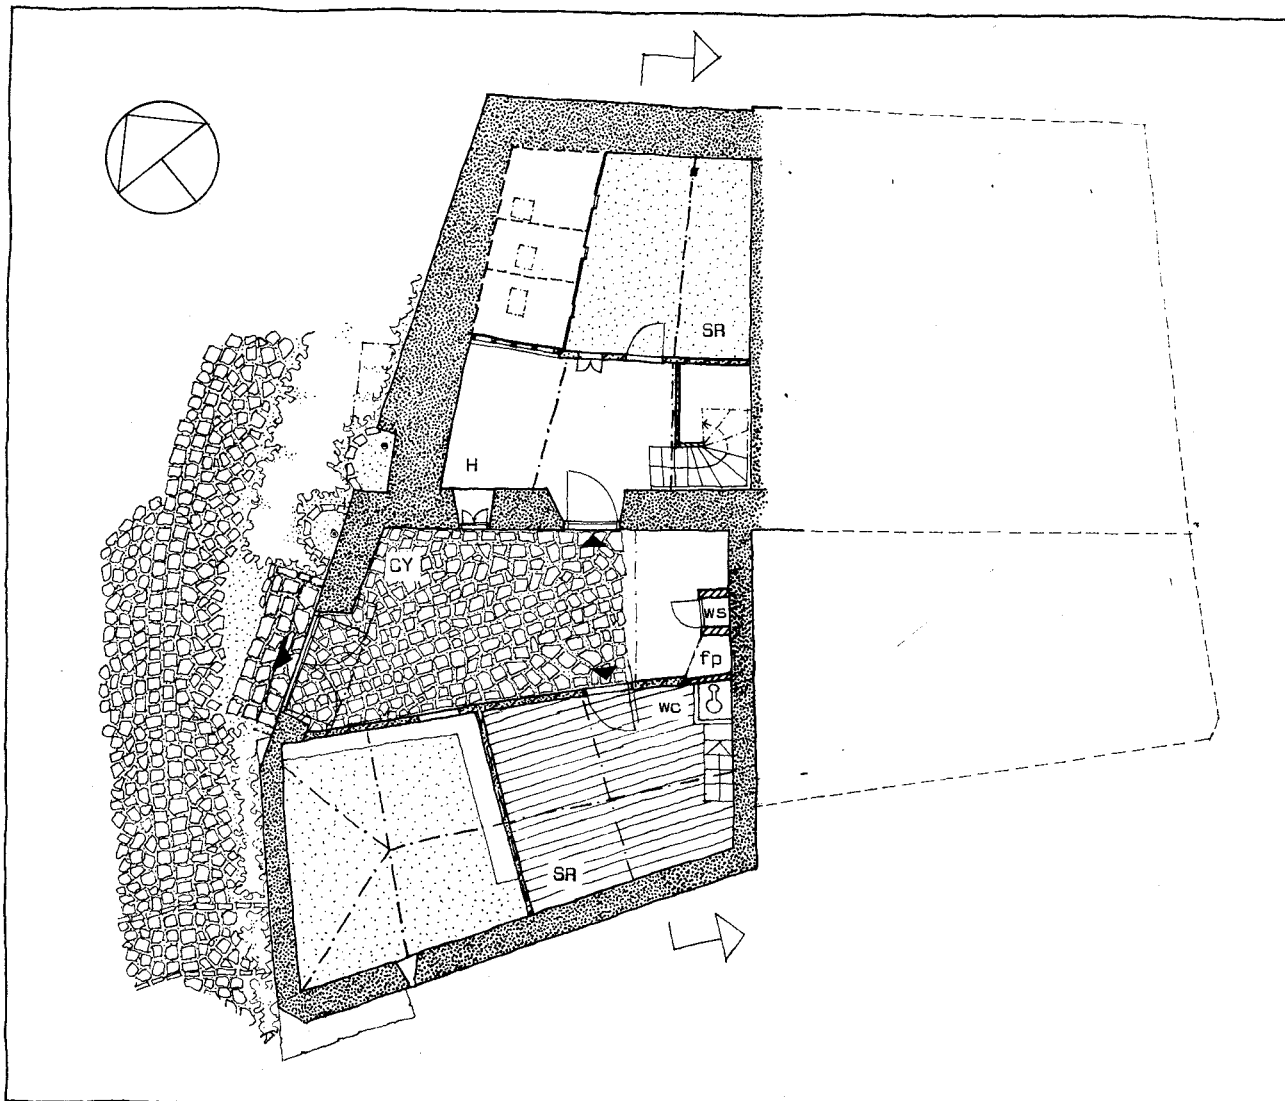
Plan of basement in dwelling, 1st floor in outhouse BB2w 1:150.
